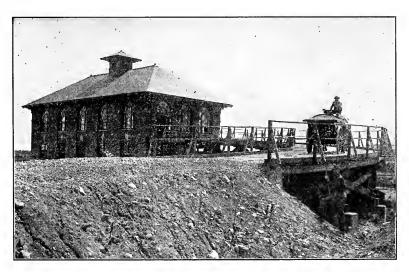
Garbage Loading Station, Showing Inclined Driveway, Columbus, Ohio.
